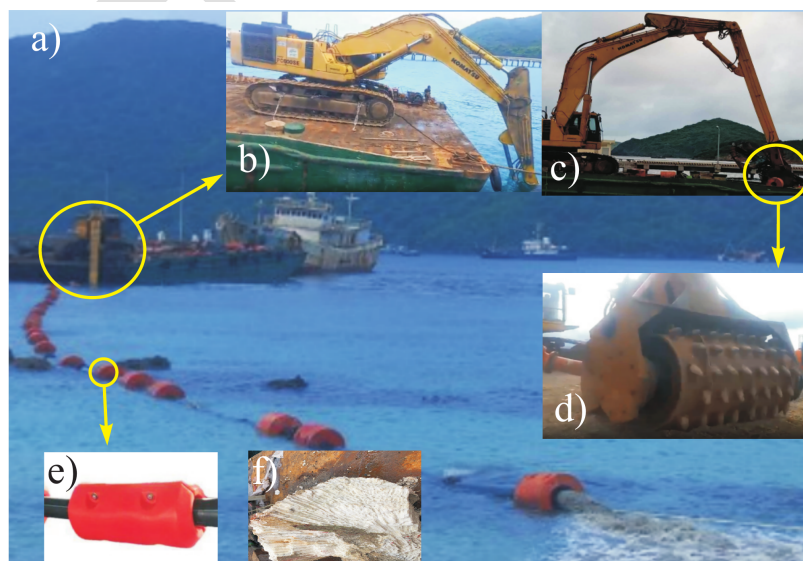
Excavator with integrated drum cutter at construction site: (a) long-reach excavator equipped with a drum cutter for dredging, (b)–(c) close-up view, (d) drum cutter, (e) floating pipe, and (f) real cut-mark
